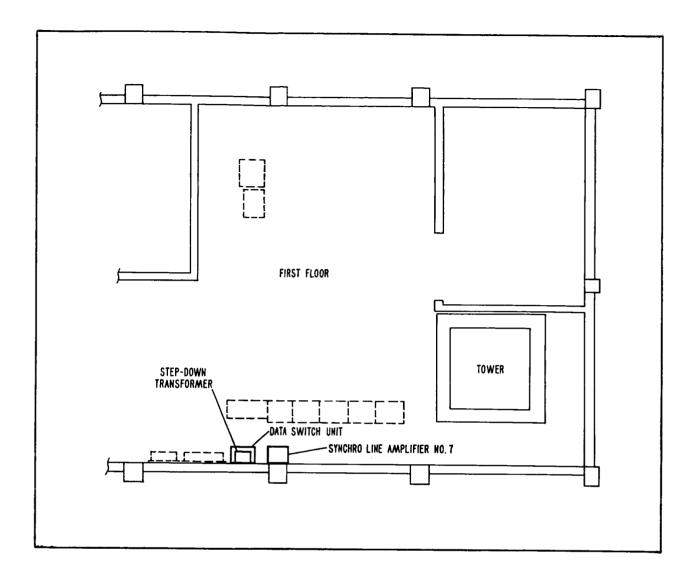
Acquisition System Equipment Layout, FPS-16 Building
